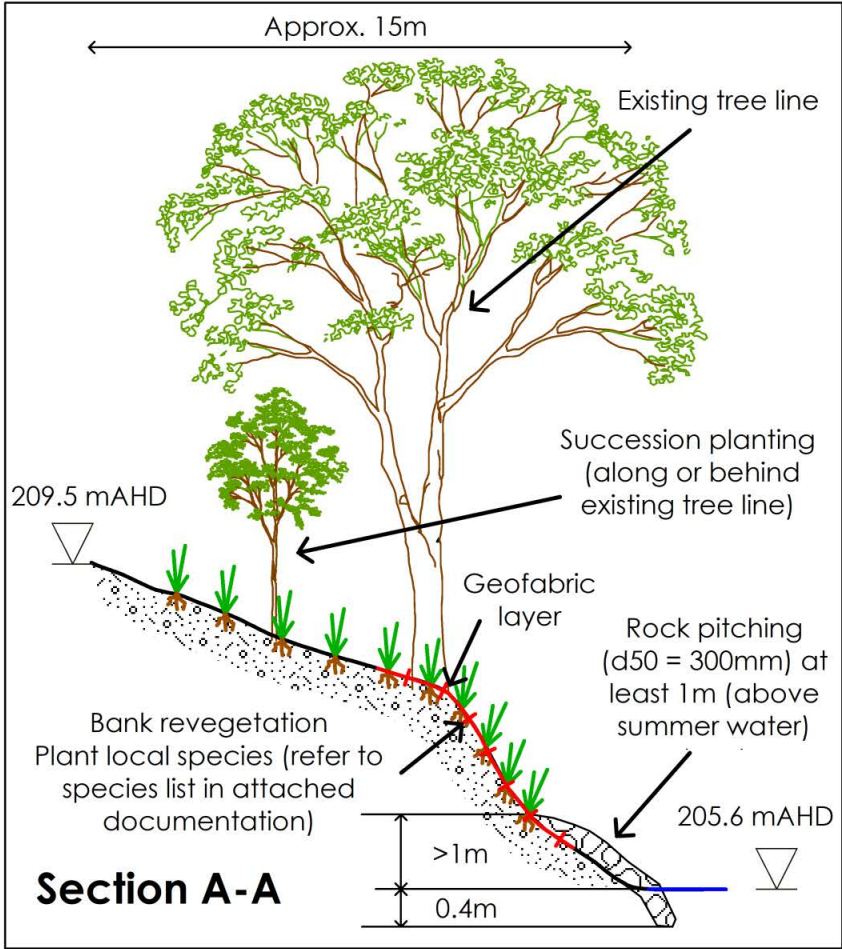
Ranford Pool Site Concept - Detailed Restoration Plan
